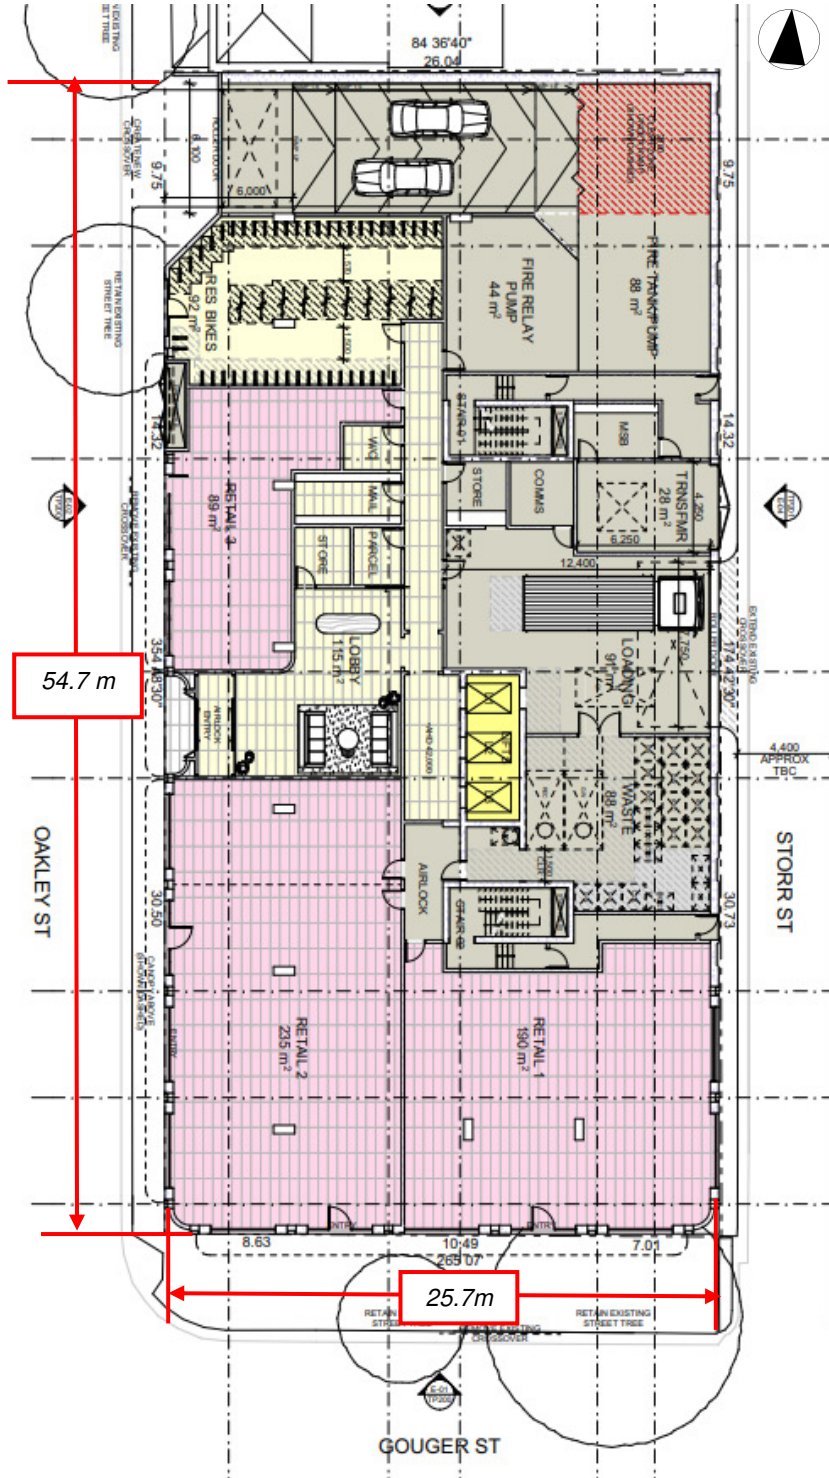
Ground floor plans with the plan-form dimensions overlaid.
